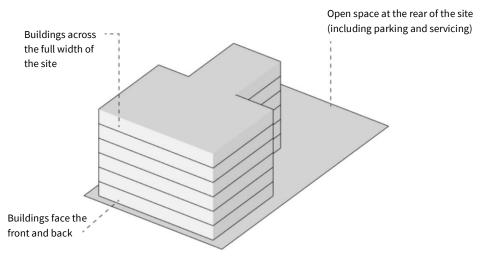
Illustration of a building utilising the full width of the frontage of the site. This offers the greatest potential to create a safe and engaging walkable neighbourhood.
